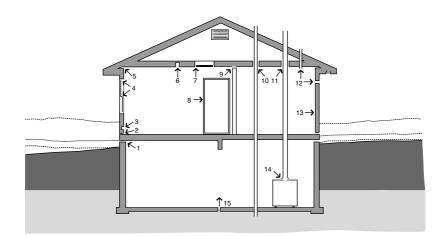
Typical air leakage sites in a house. (1) Joints between joists and foundation; (2) joints between sill and floor; (3) electrical boxes; (4) joints at windows; (5) joints between wall and ceiling; (6) ceiling light fixtures; (7) joints at attic hatch; (8) cracks at doors; (9) joints at interior partitions; (10) plumbing-stack penetration of ceiling; (11) chimney penetration of ceiling; (12) bathroom and kitchen ventilation fans; (13) air/vapor barrier tears; (14) chimney draft air leaks; (15) floor drain (air enters through drain tile) (from Nisson and Duff, 1985).
